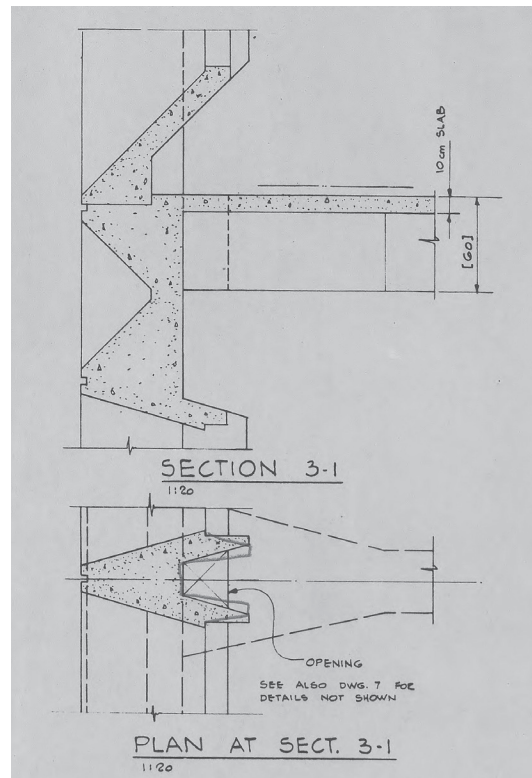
Joints of the beams and spandrels, IBM Research Center, La Gaudie, France, 1960-07-18. The head of beam was thickened to leave openings for pipework. (Syracuse University Library 1960)
